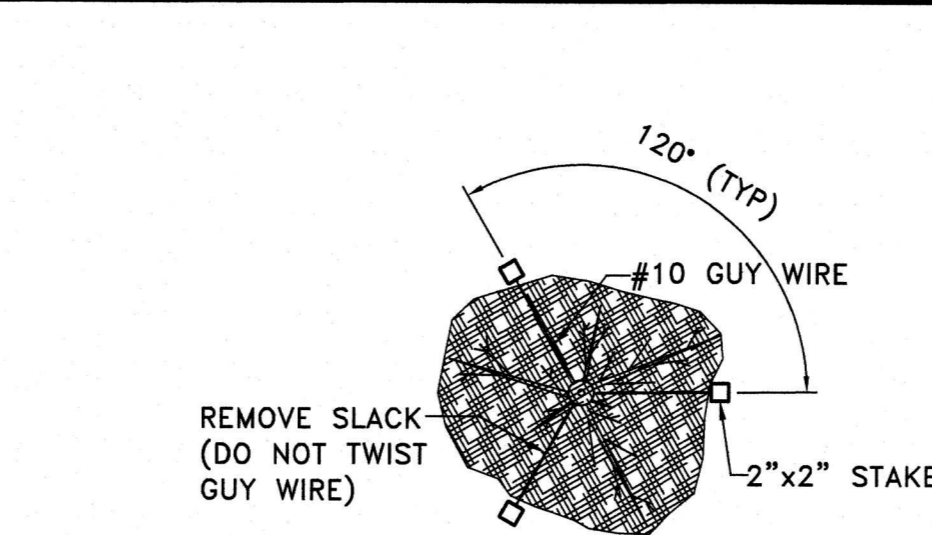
TYPICAL EVERGREEN TREE PLANTING DETAIL
